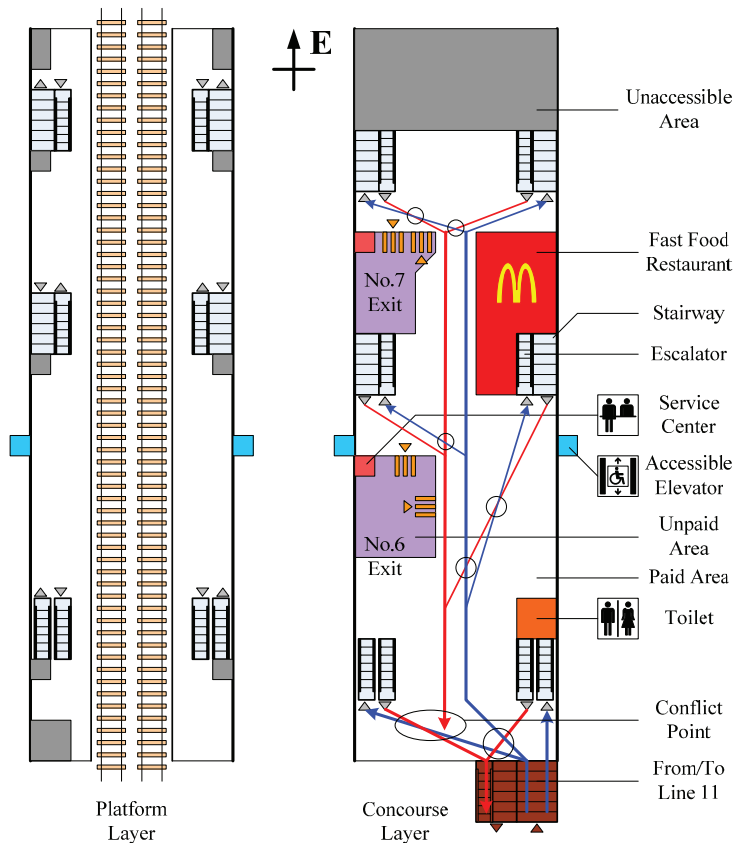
Schematic plan of the overground part of Caoyang Road Station
